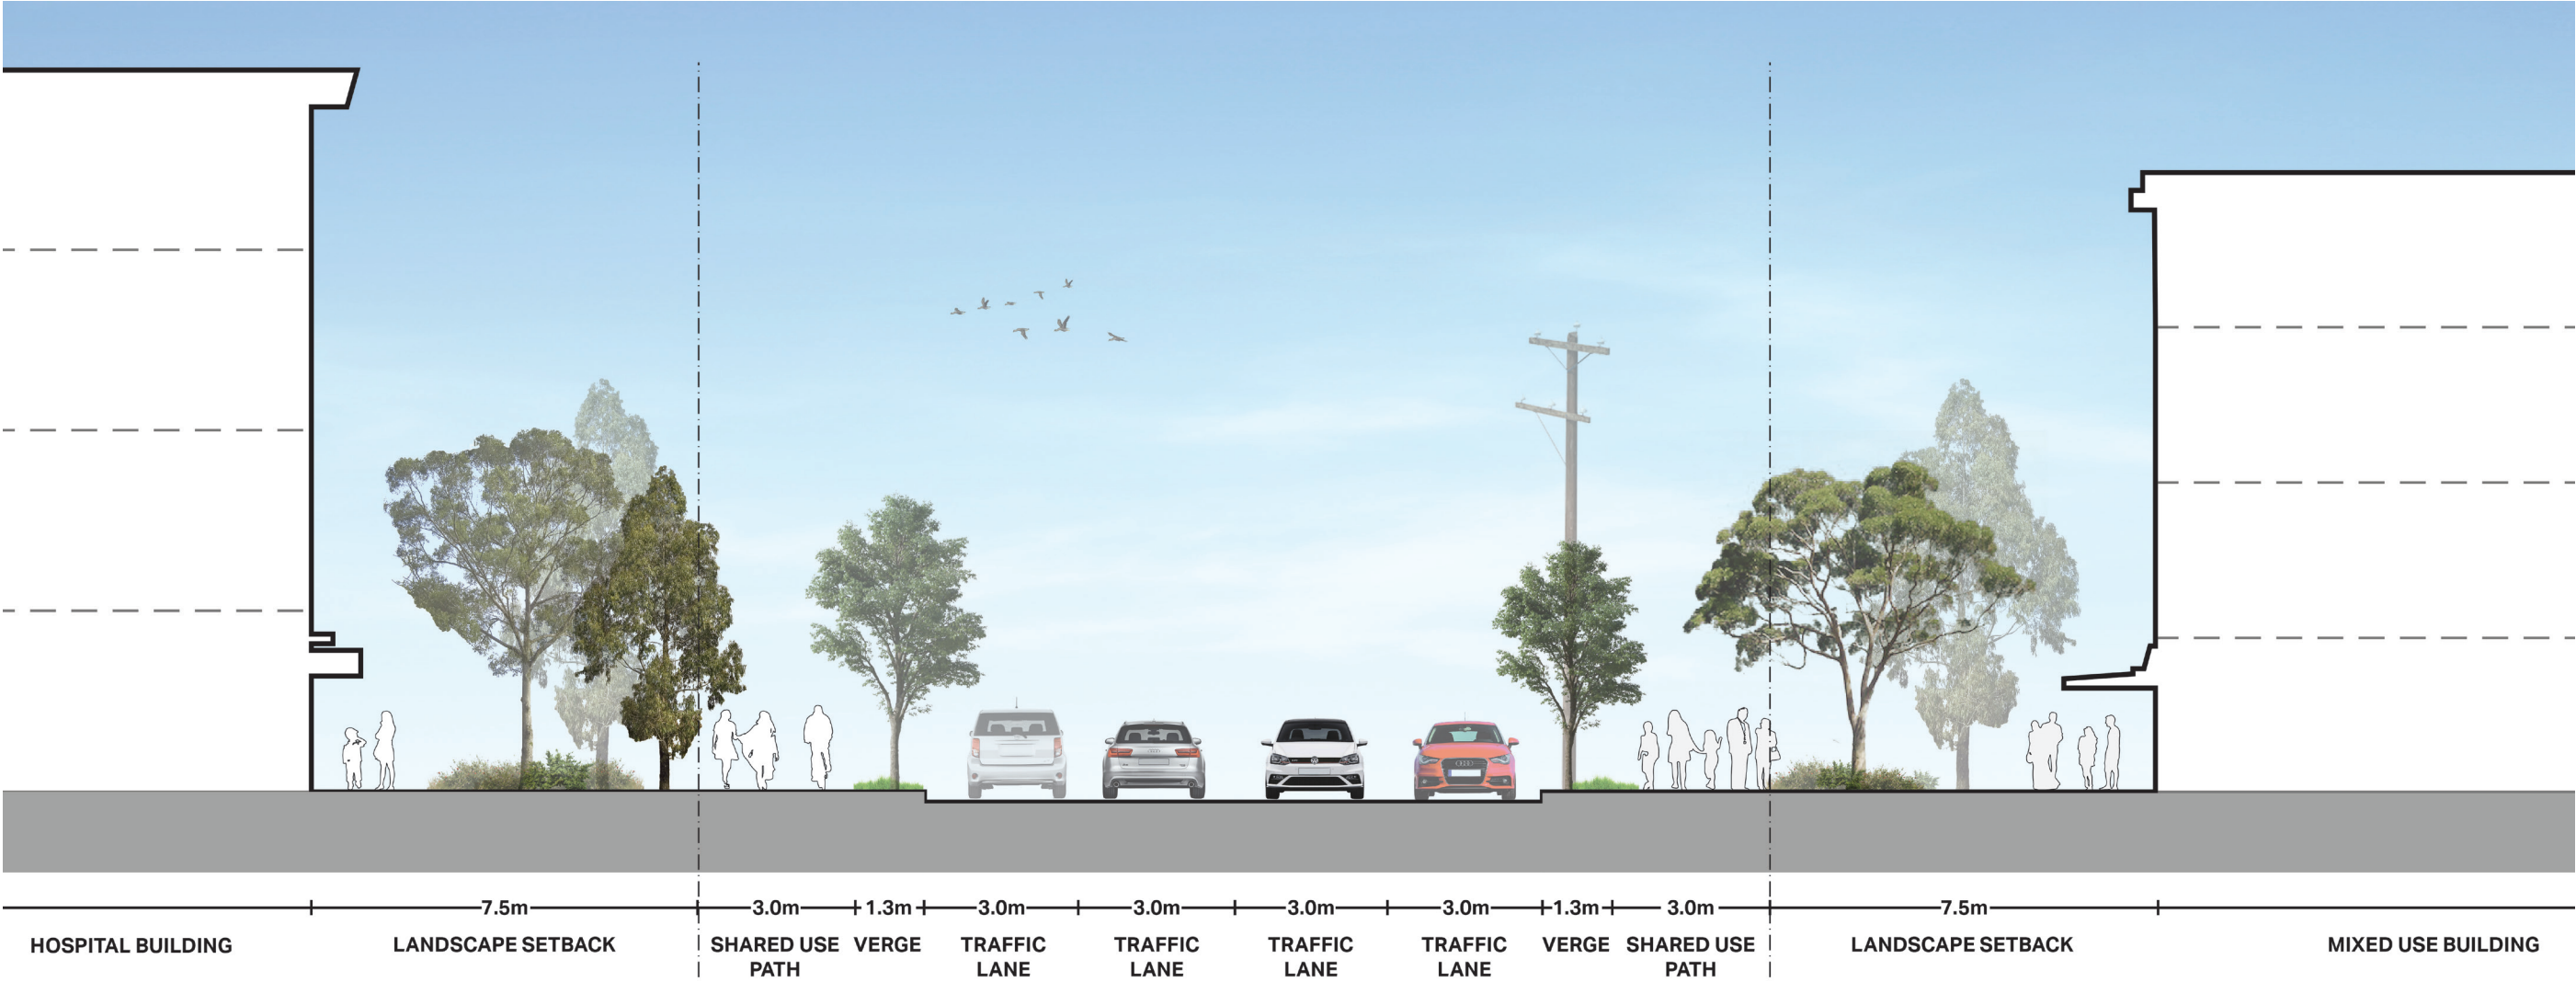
Furlong Road - Typical Cross Section (Option 2)
